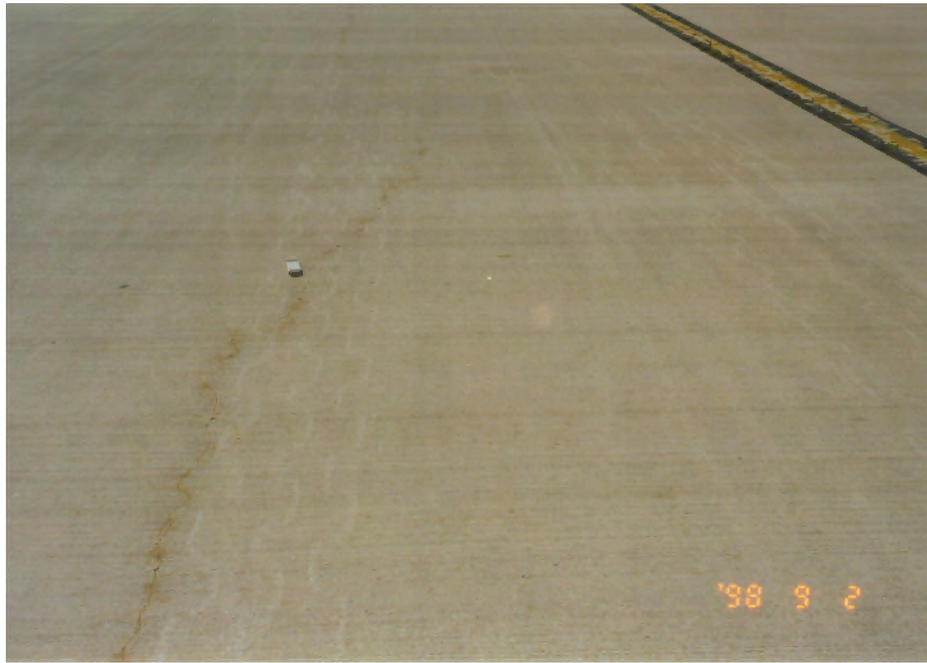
LONGITUDINAL CRACK IN FIBROUS PAVEMENT, IN AIRCRAFT WHEEL PATH (SEPT. 1998)
